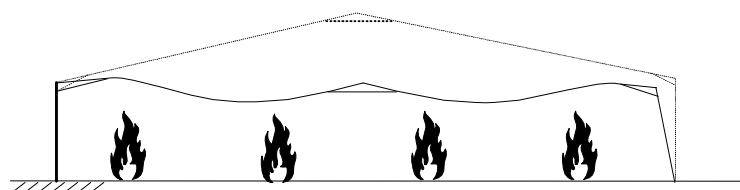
Portal frame in fire - The column base and wall may be designed to withstand the collapse of the rafter.
